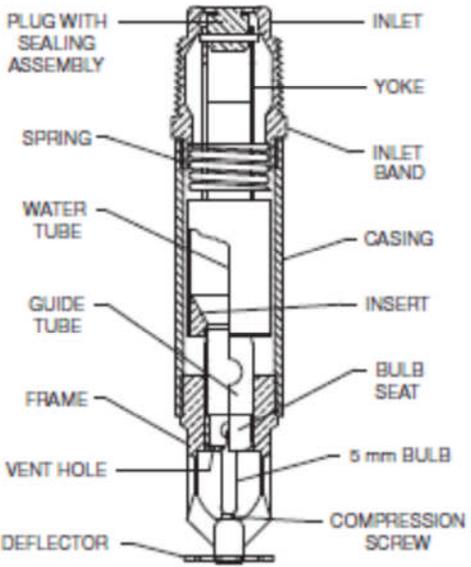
Dry Sprinkler Showing Plug Sealing Assembly that Keeps Water Tube Dry
